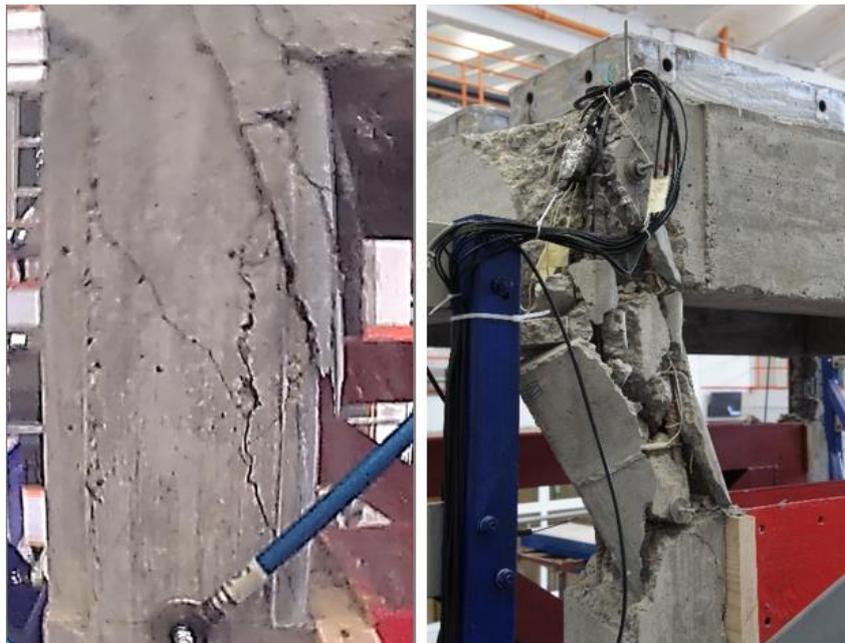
(left) Shear crack propagation, captured during the test, (right) Total collapse of the short column and spalling of concrete
